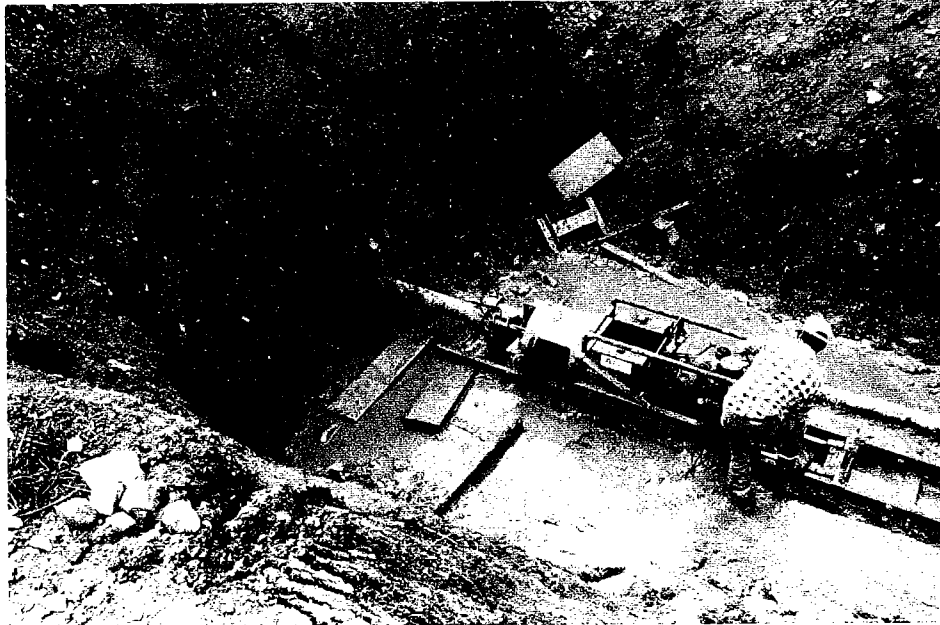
Plan View Of Underdrain Trench And Outlet Pipes
